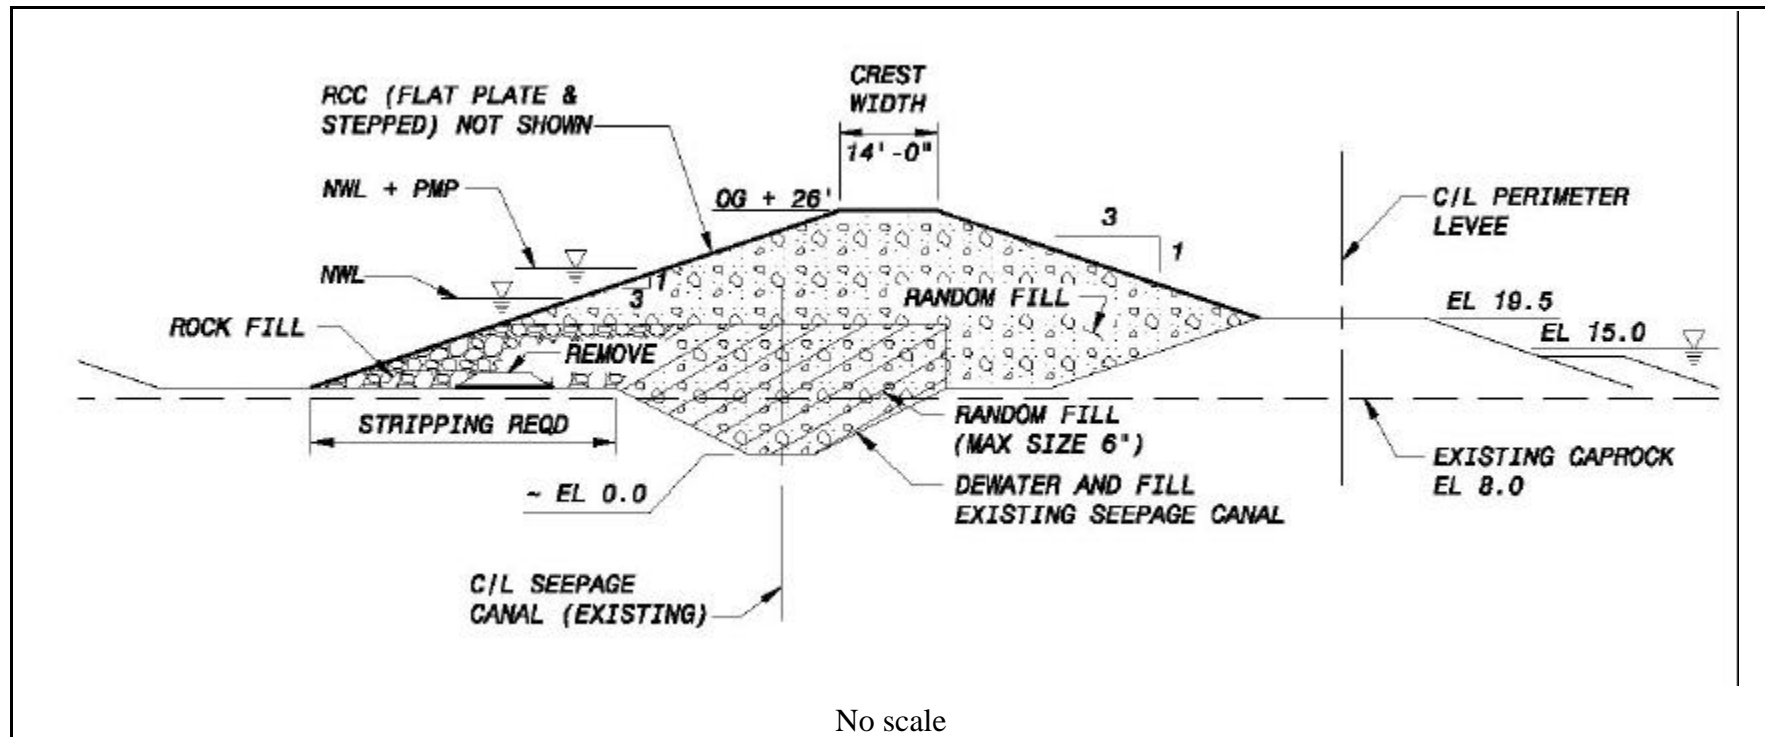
Embankment Section Adjacent to STA-3/4 Supply Canal Levee
